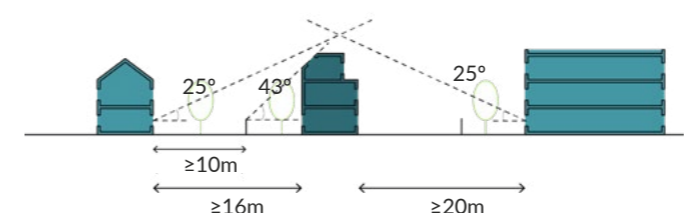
An off-street development in an Enhance area achieves a 16m separation distance to the existing neighbouring dwelling by having no facing windows above ground floor, with first floor windows on flank walls, and windows in the roof slope at top floor. In this case, any resultant blank frontages would need to be appropriately addressed through design.
